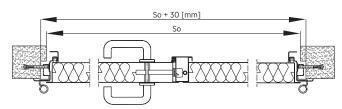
Installation of a double-leaf door with a corner frame to a masonry wall – horizontal cross-section
